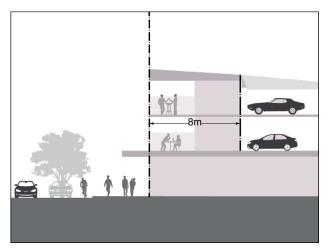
Permitted parking areas to upper floors for commercial or mixed use development
